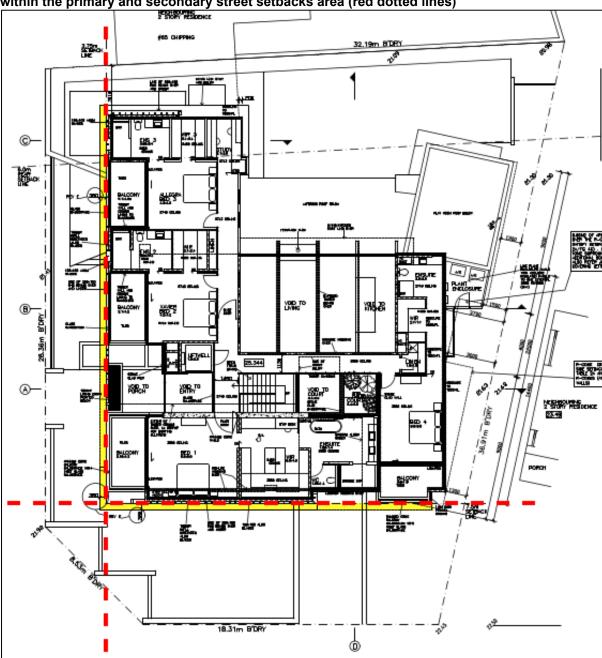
Marked-up first floor plan showing the area of the roof eaves (highlighted yellow) within the primary and secondary street setbacks area (red dotted lines)
